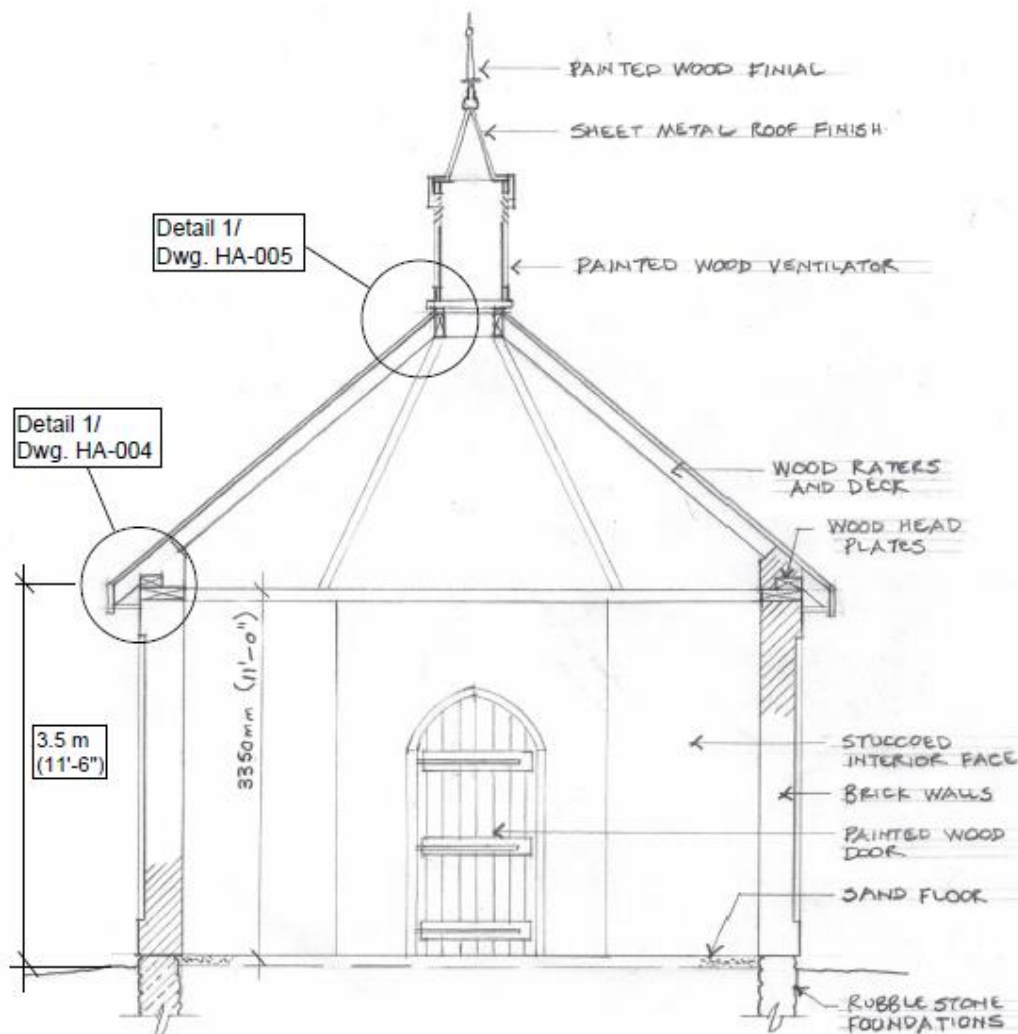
As-found cross section of the Vault (Dwg. No. HA-002), looking east (source: Edwin Rowse Architecture Inc.).
